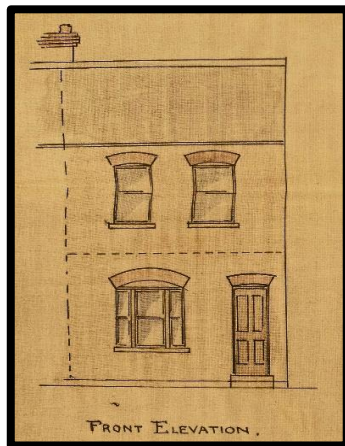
No. 35 Madras Road, proposed front elevation (CA CB/2/SE/3/9/3212)
